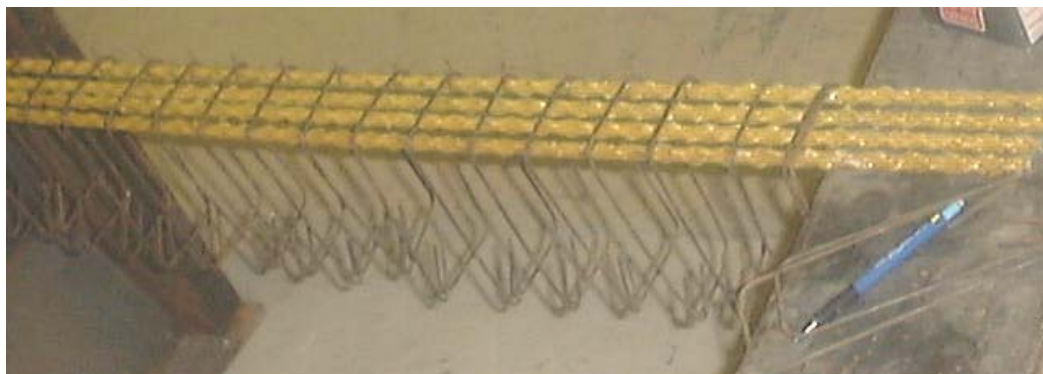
Construction of Reinforcement Cage for Prototype DHFRP Reinforced Beams.
